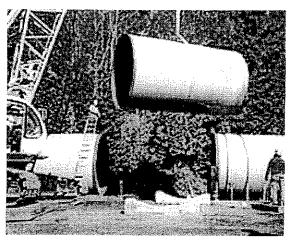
Installation crews make final closure in the center of the 6,050-feet (1.8 km) penstock.
